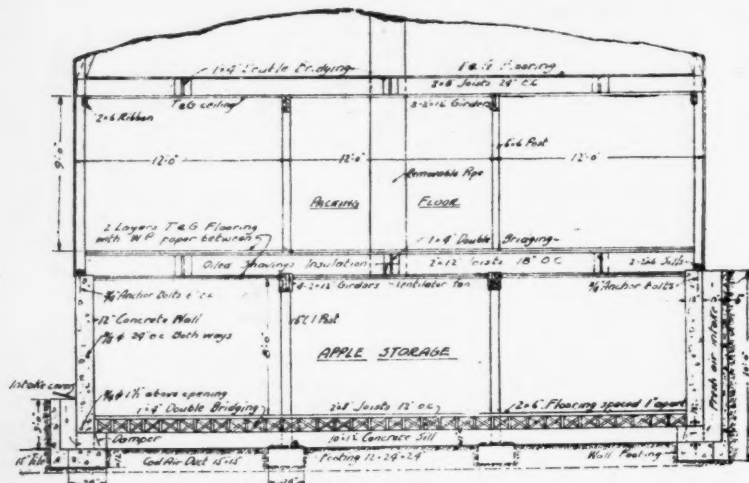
Section plans through end view of Bedford storage cellar, showing the position of air intake and outlet flues, construction of false floor and insulation of ceiling
